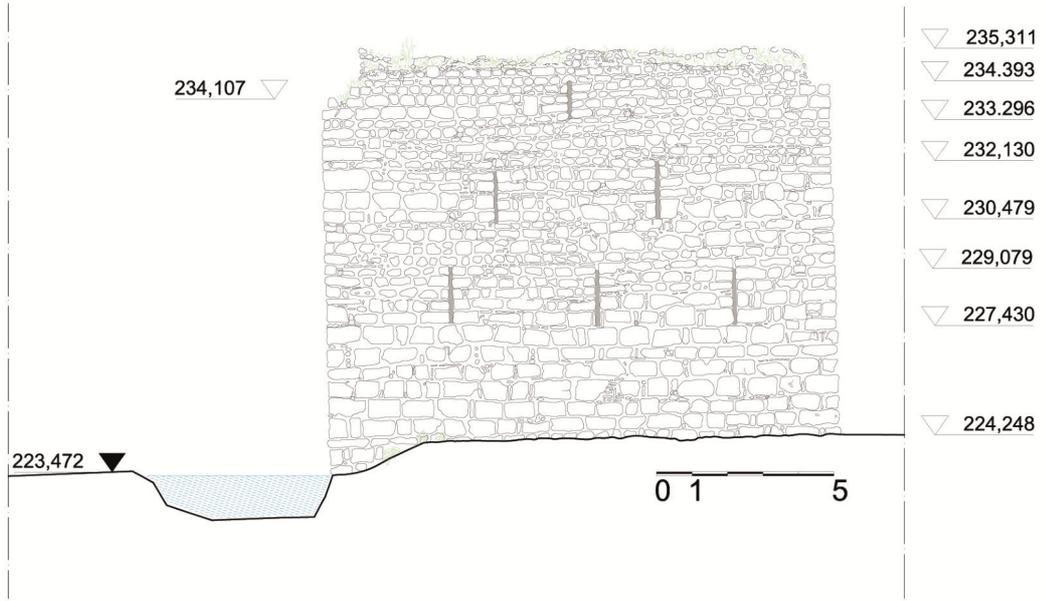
WT, NW façade, drawing by M. Çavdar and author (2013).
